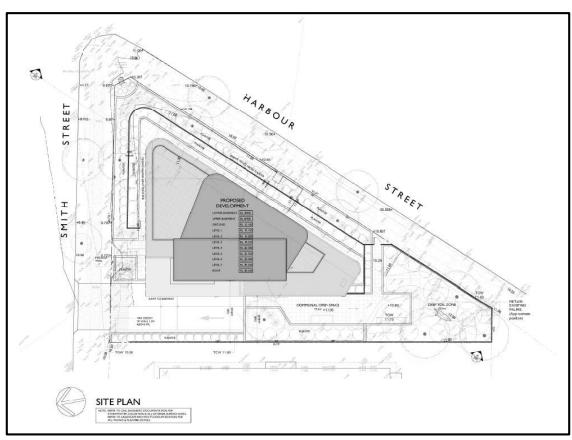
Proposed Site Plan (*Source: ADM Architects)
